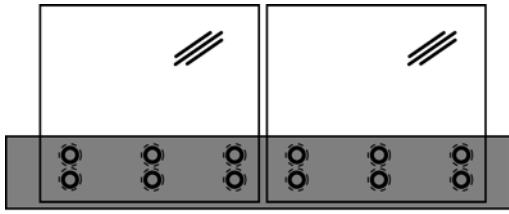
Type VI: Point Supported Only—Glazing as Structural Member
